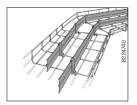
is used for mounting of Separating Plate B36 onto Mesh tray.
